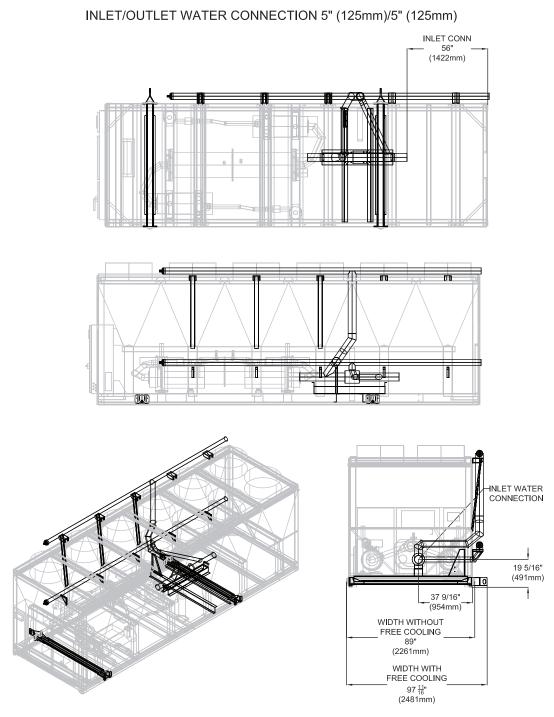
RTAF unit dimensions - 150, 170, 180 ton units with free-cooling
